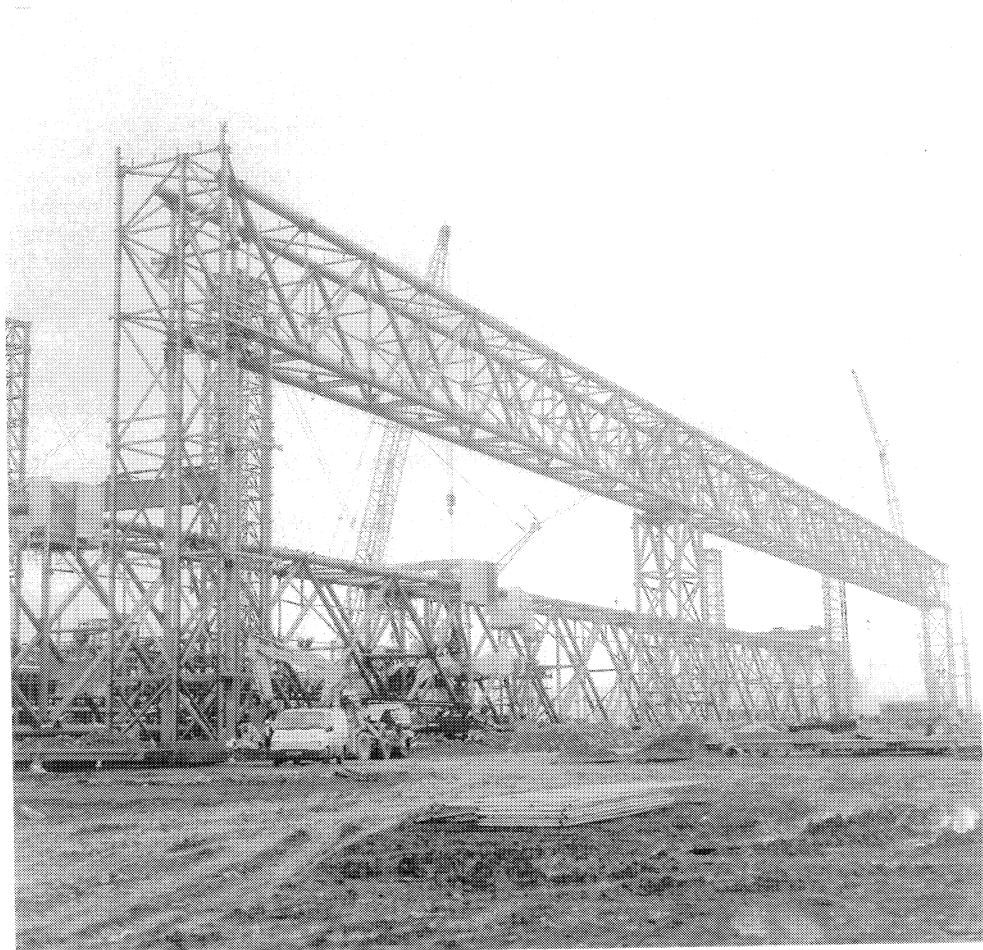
Erection – very large pieces can be erected with the correct equipment. British Airways heavy maintenance hanger, Cardiff, Wales (dimensions 14.5 m × 8 m × 232 m; 1000 tonnes and 9 m × 5 m × 232 m; 600 tonnes)
